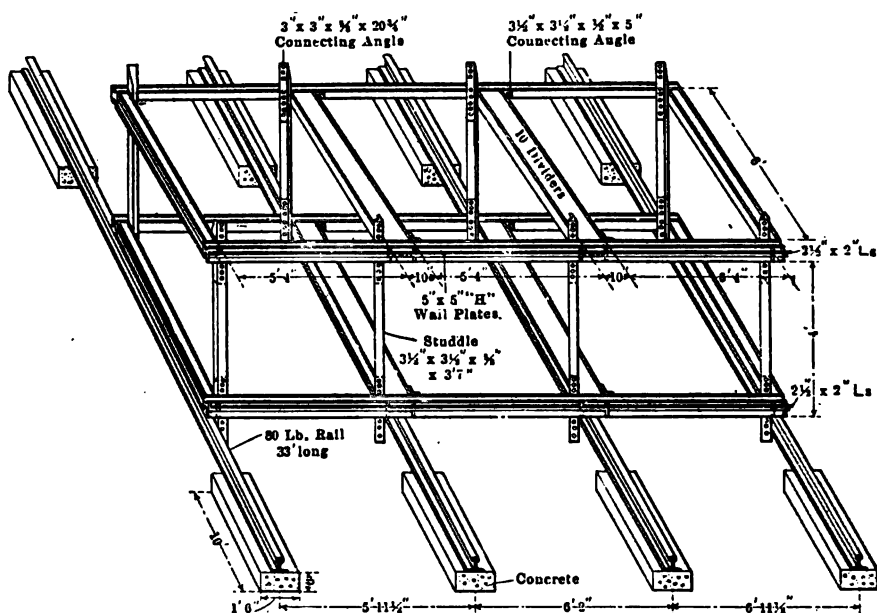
STEEL SHAFT SETS AT WHITESIDE MINE.
